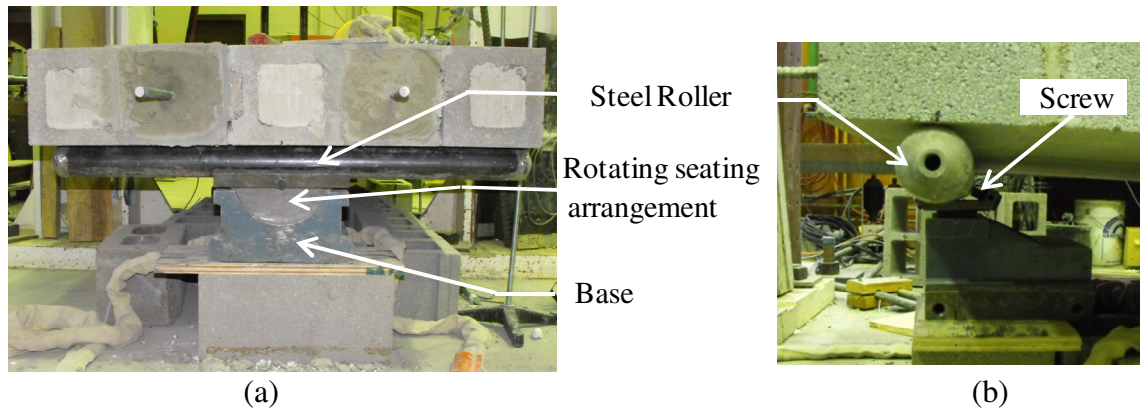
Support conditions for the wall splice specimens: (a) front view, and (b) side view.
